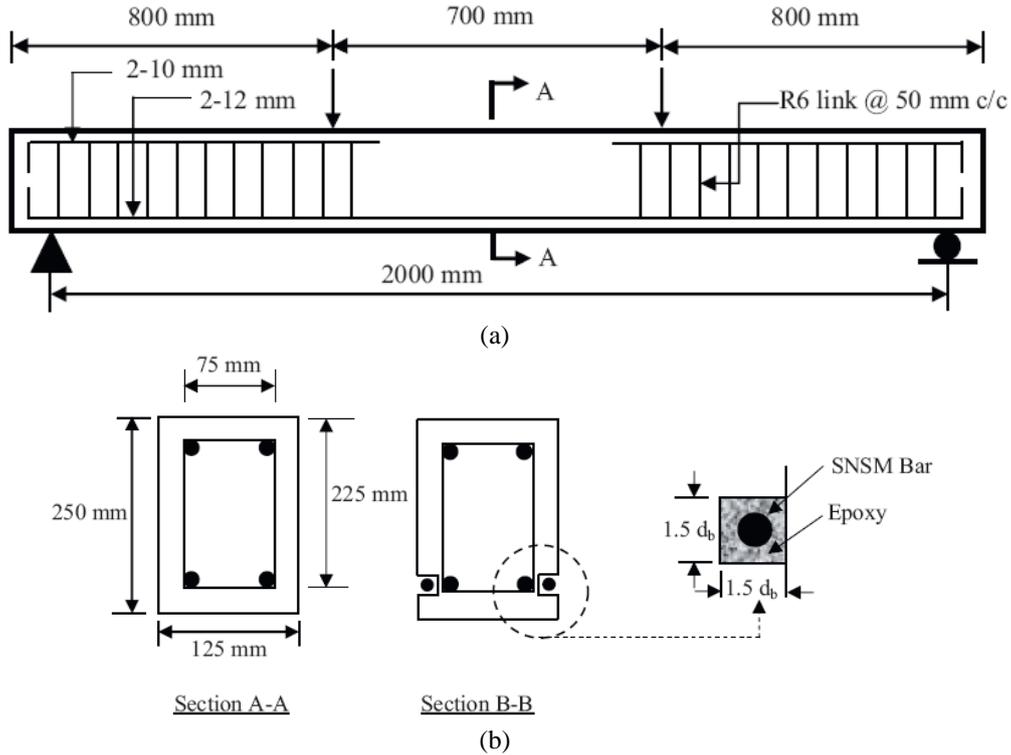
Control and strengthened beam details; (a) Control beam and (b) Strengthened beam [38].
